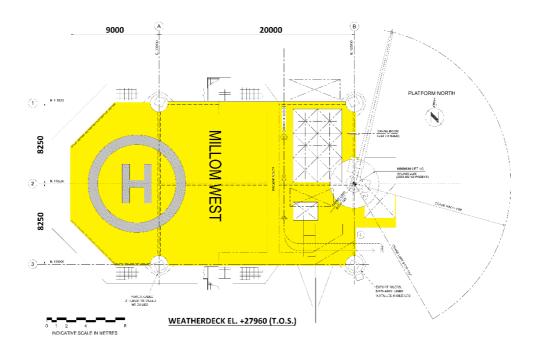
Millom West platform outline plot plan on weather deck
